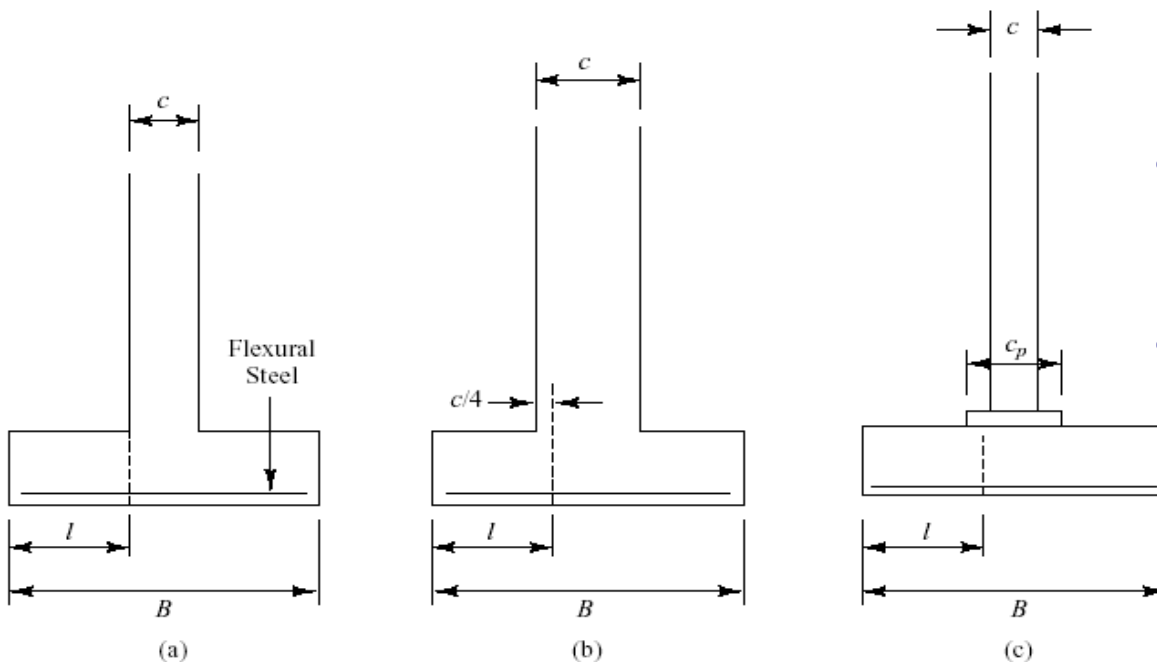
Location of critical section for bending: (a) with a concrete column; (b) with a masonry column; and (c) with a steel column.
